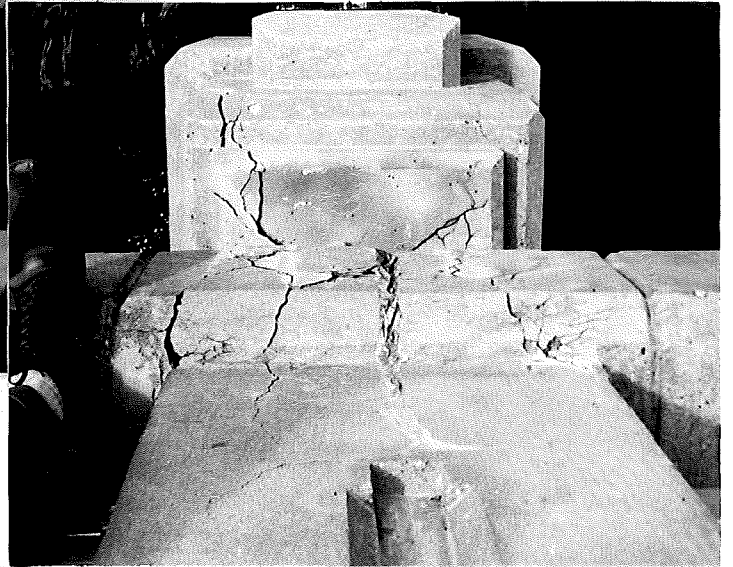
TYPICAL CRACK FOR ENTIRE LENGTH OF PIER ABOUT ONE FOOT DOWN FROM THE TOP EDGE. THIS OCCURRED ON BOTH SIDES OF ALL FOUR PIERS.
